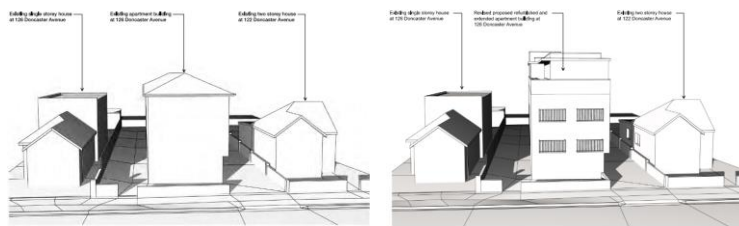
Existing and proposed northern 3D shadow impacts on 21 June
